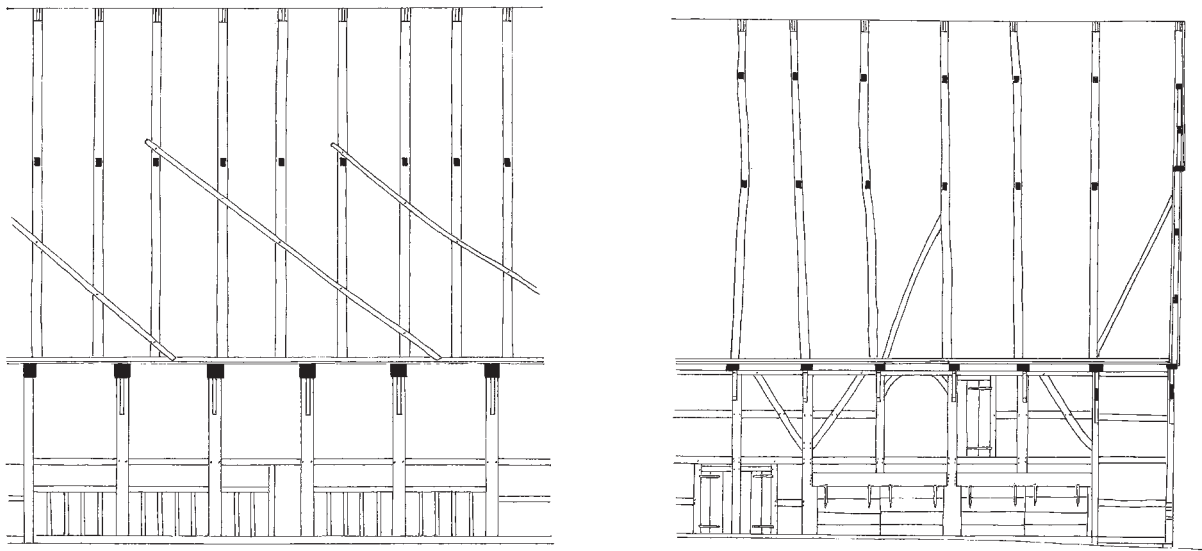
Roof strengthening in Northwest Germany. *Schwertlatte* intersecting the rafters – *Windrispe* between two rafters – *Windrispe* between roof plate and rafter.
